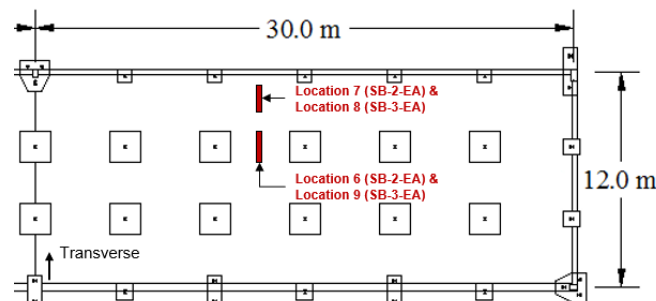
Measured location in slabs on beam at construction site 1 to study the effects of external restraint
